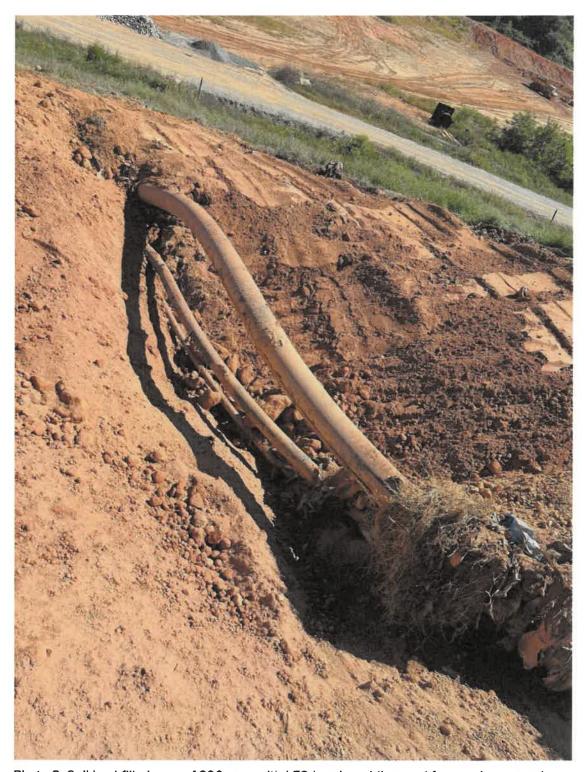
Soil backfilled area of SSO area with LFG header, airline, and forcemain exposed.
